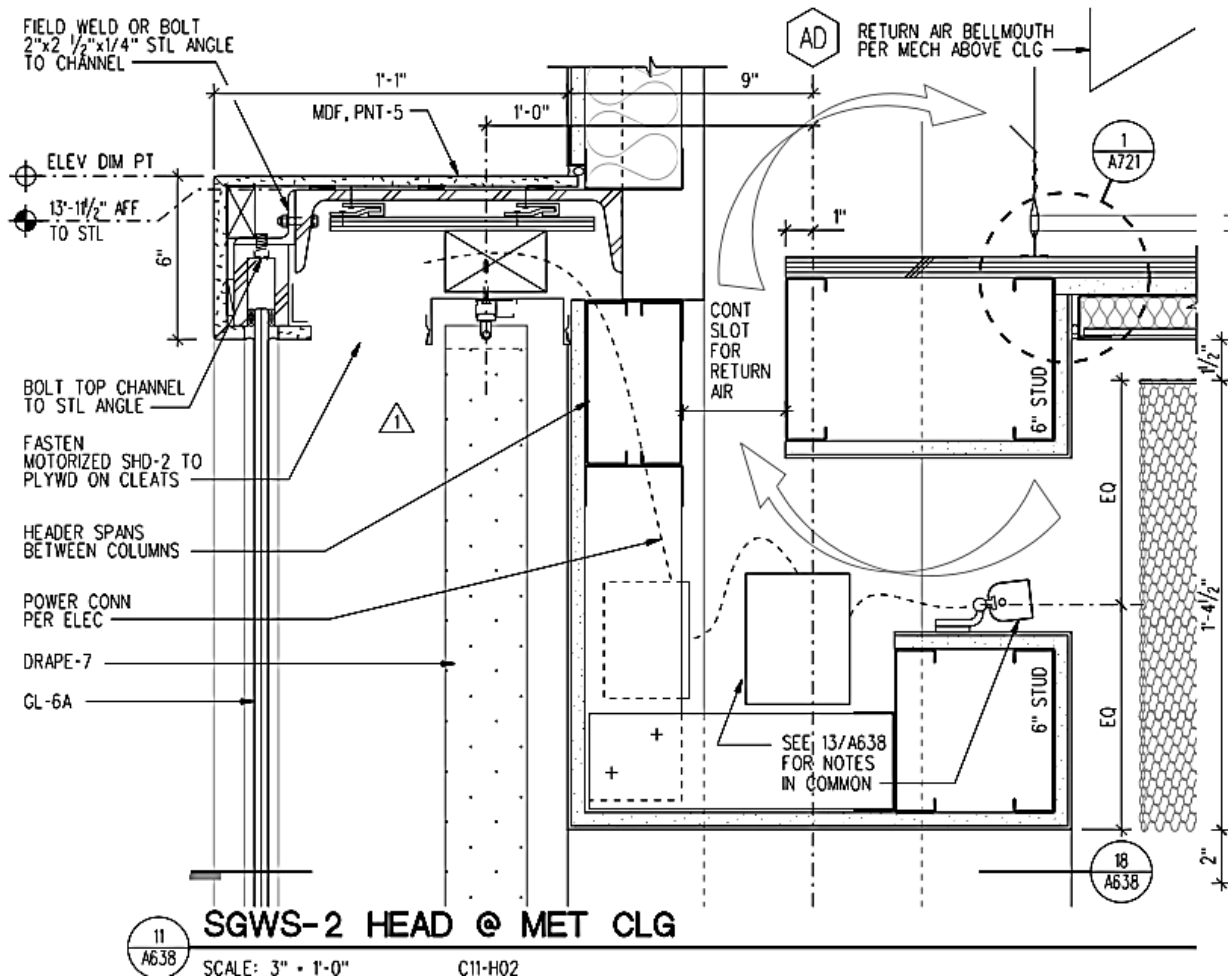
Patron’s Lounge Structural Glass Wall Support Framing Detail
